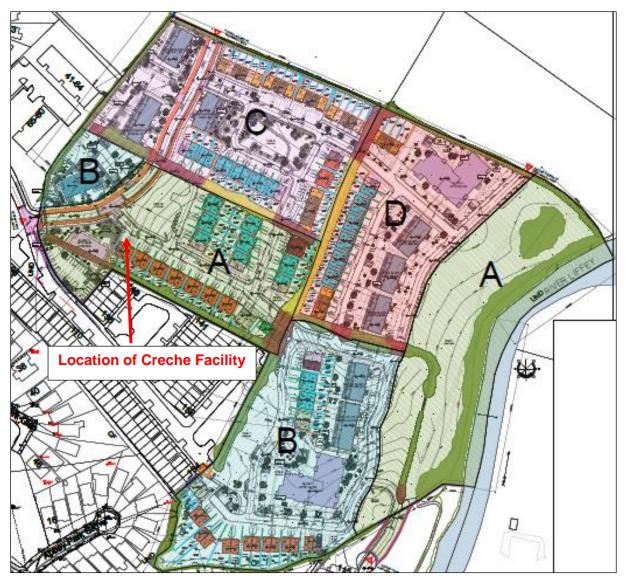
Phasing plan for residential development refused under ABP Ref. ABP-305905-19, we note the location of the creche facility as indicated.
